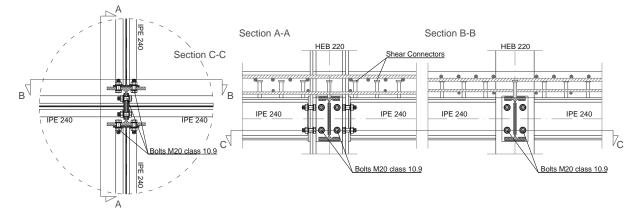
Beam-Column Interior Joint with Flush End-Plate Connection.
